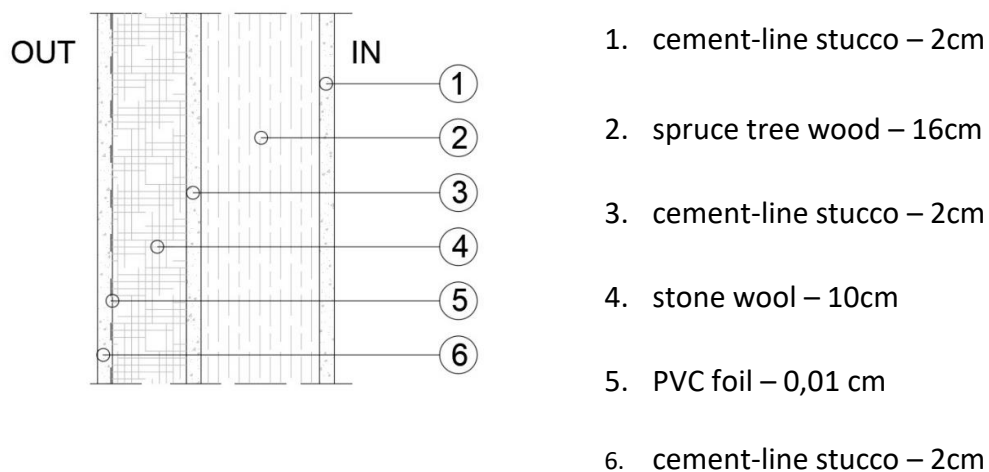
Bondruk wall with wood filling, type 3. (adapted Hadrović 2017)
